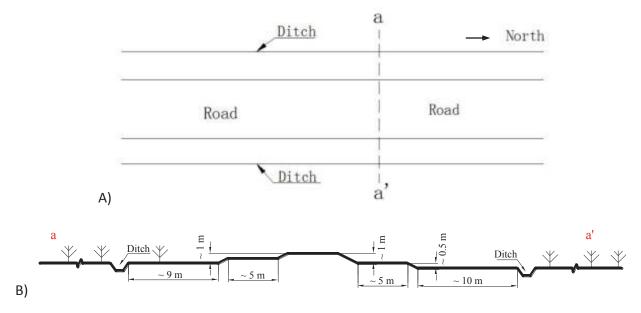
Schematic illustration of the Enger Creek adaptation site for A) Localisation of proposed embankment cross section and transverse profile; and B) a-a' embankment cross section at km 1863.5.
